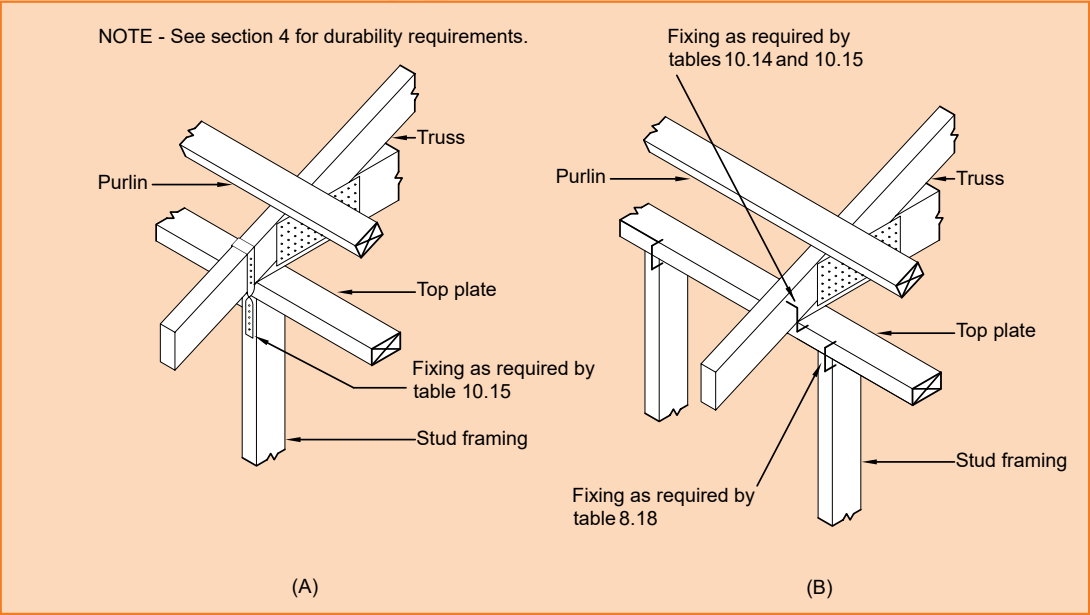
Truss/top plate connections (see 10.2.2.6)
